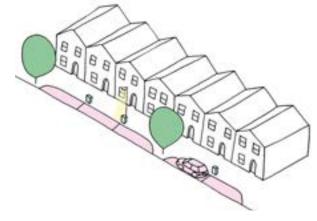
On street parking, electric parking provision and street trees incorporated within terraced streets.
